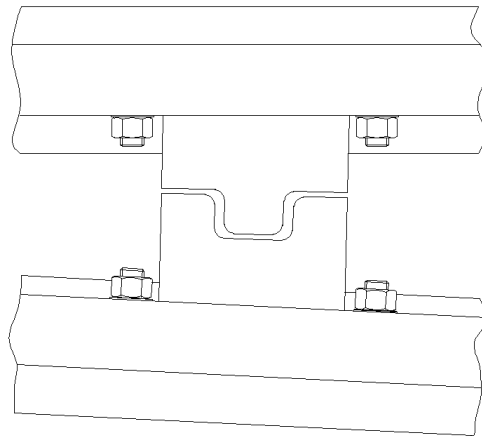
Retaining support fastened to the switch rail and stock rail webs
